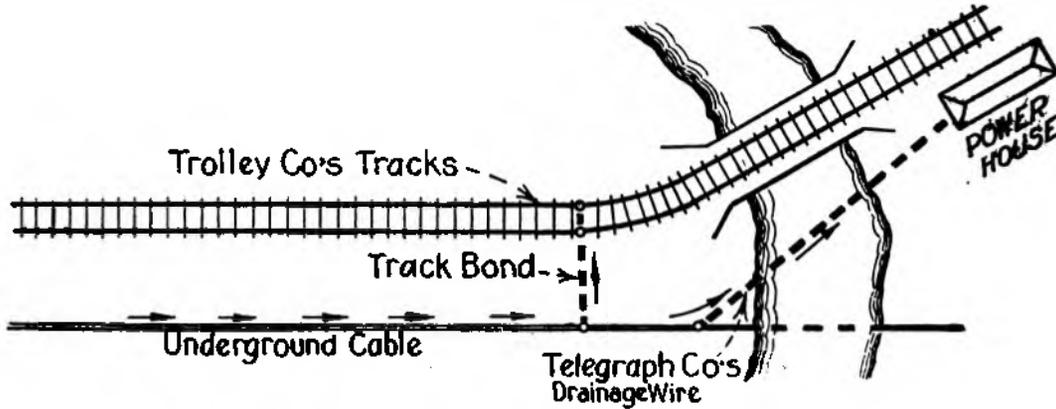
TRACK BOND USED IN CONNECTION WITH DRAINAGE WIRE.
